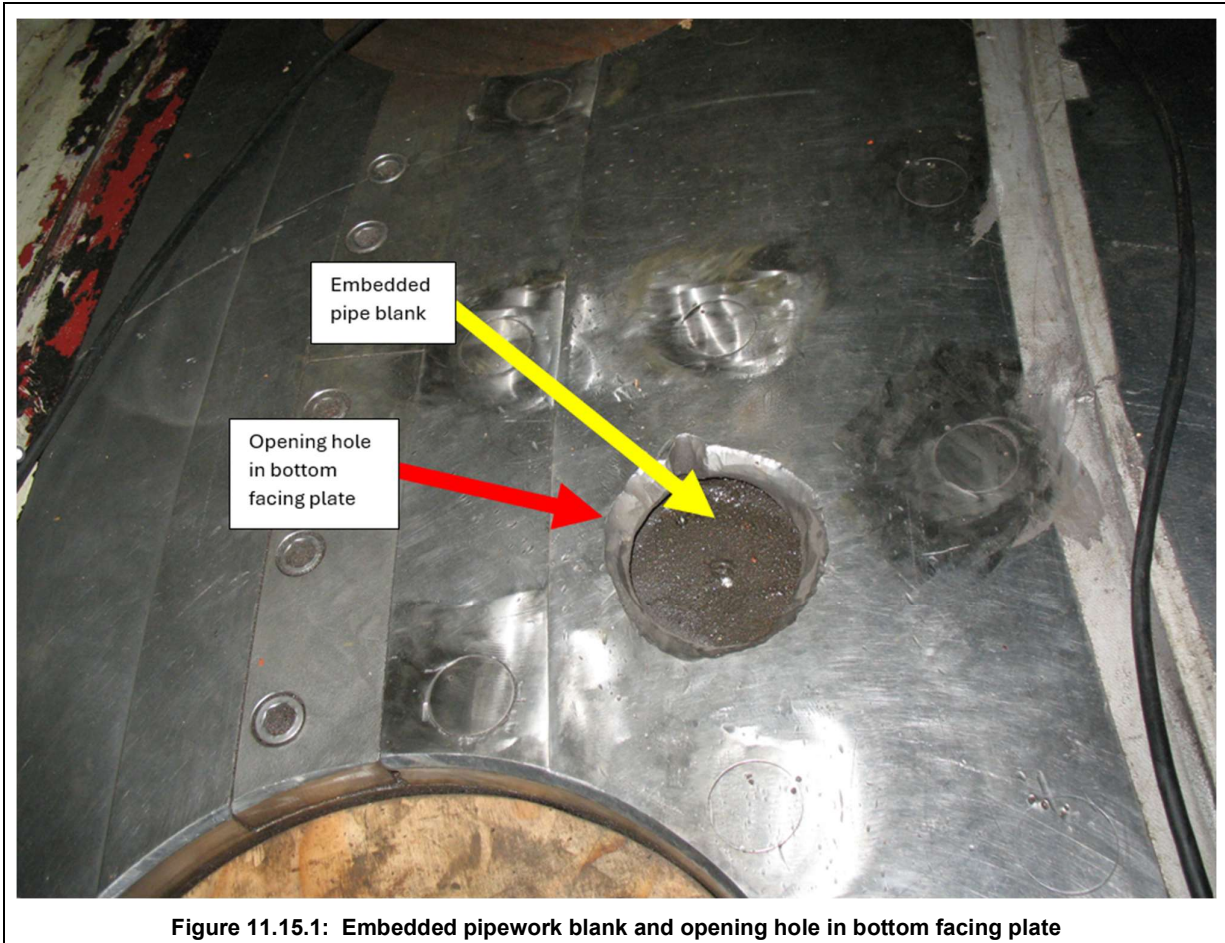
Embedded pipework blank and opening hole in bottom facing plate
